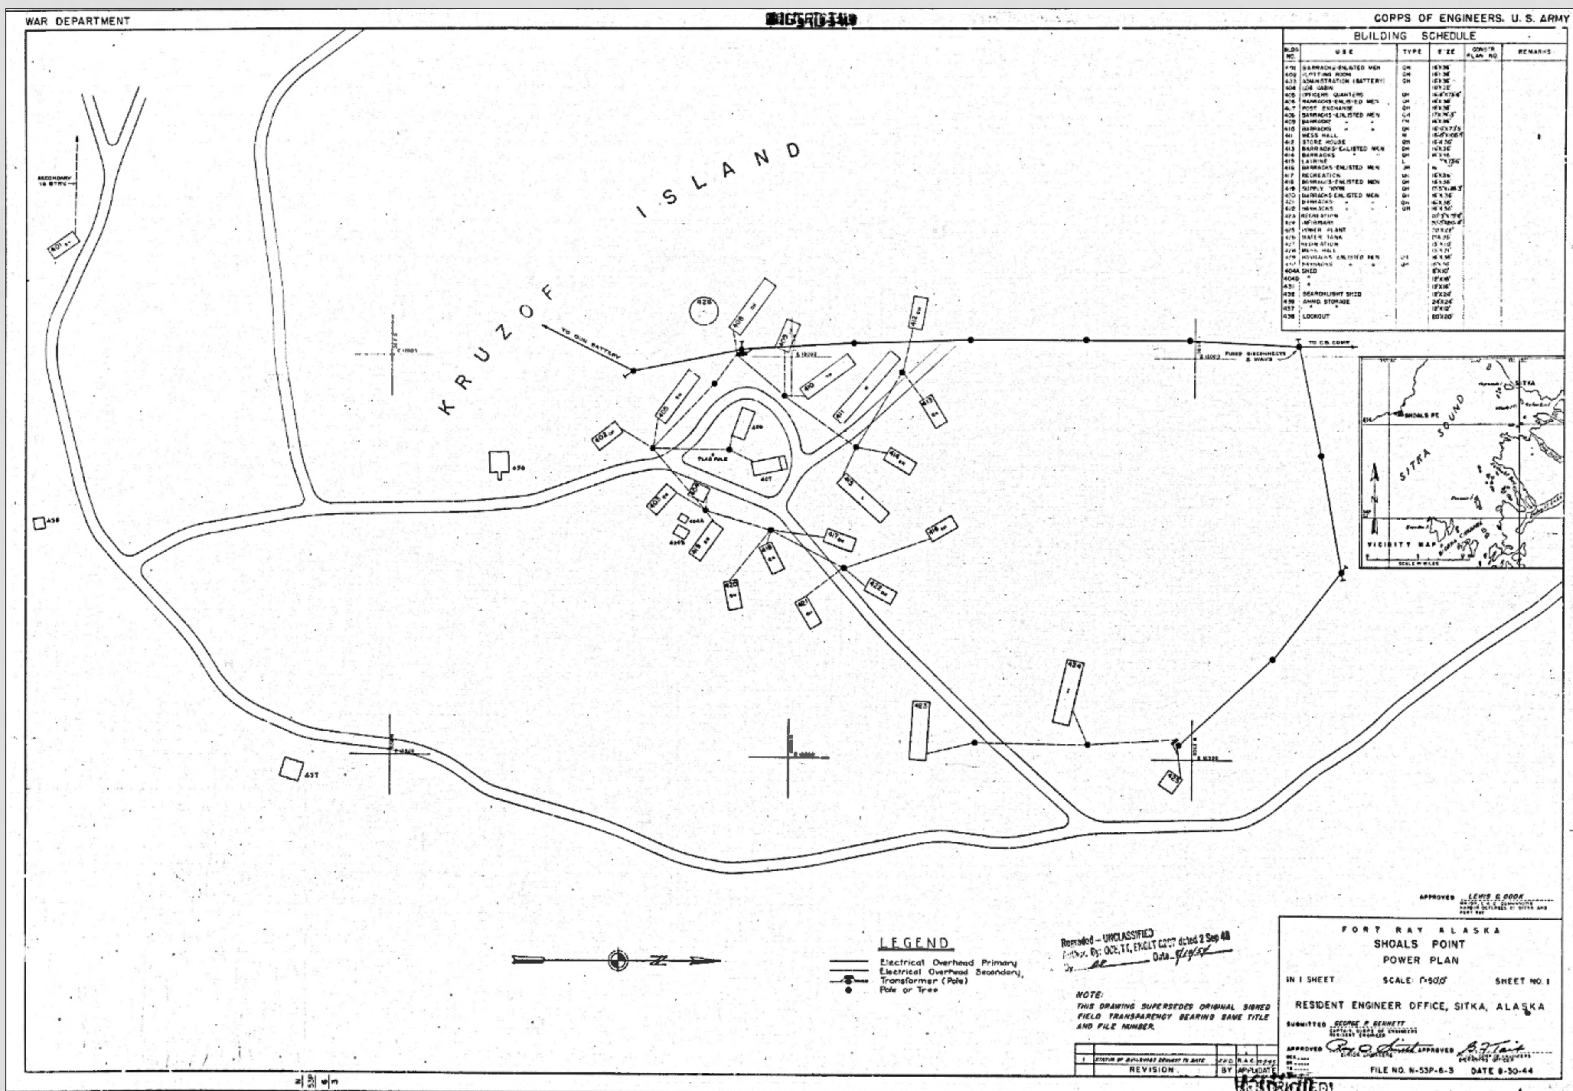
List of Main Camp buildings from 1944 Power Plan.
